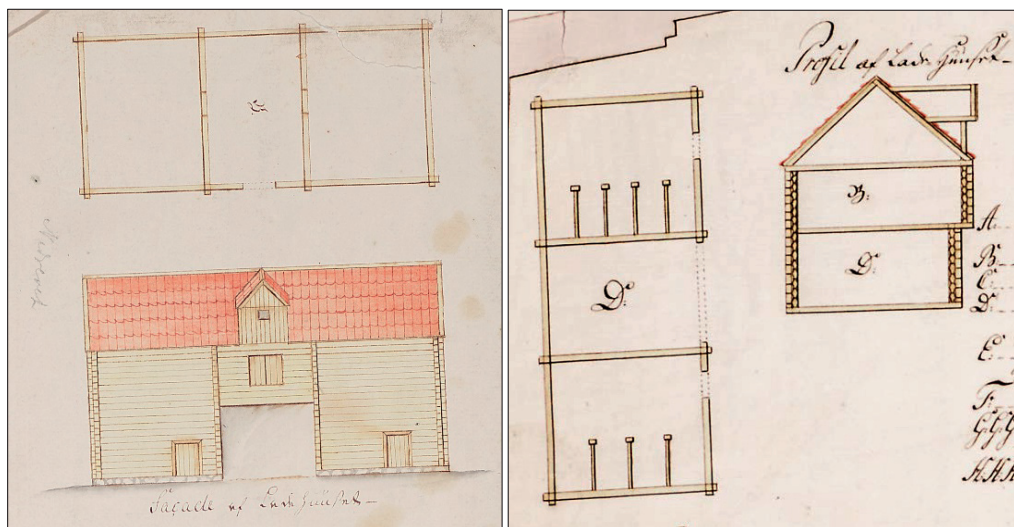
Details from Eckleff's plans of 1758. Left: Elevation of the barn's façade and plan of first (upper) floor. North to left. Right: Plan of ground floor and cross-section E-W through the middle of the building. North to bottom.¹²⁸⁸
